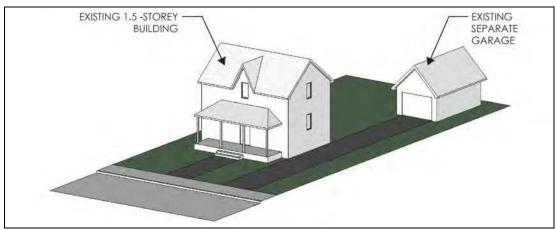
Typical existing massing for a 1.5-storey building on a contributing property
